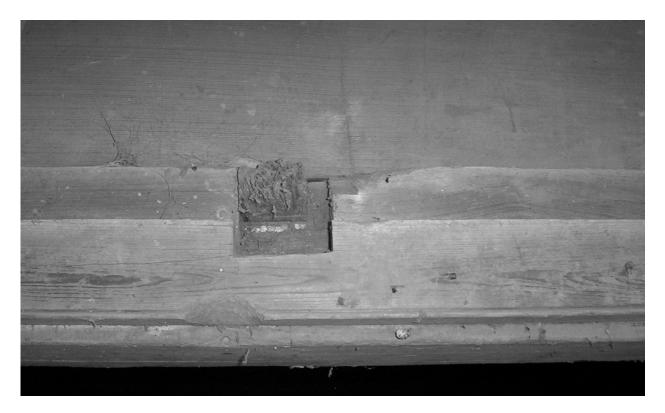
The ceiling/roof joists were added at a later date as shown in this photograph. Note the molding was cut so that the joist could be mortised into the eastern wall of Room 1.
